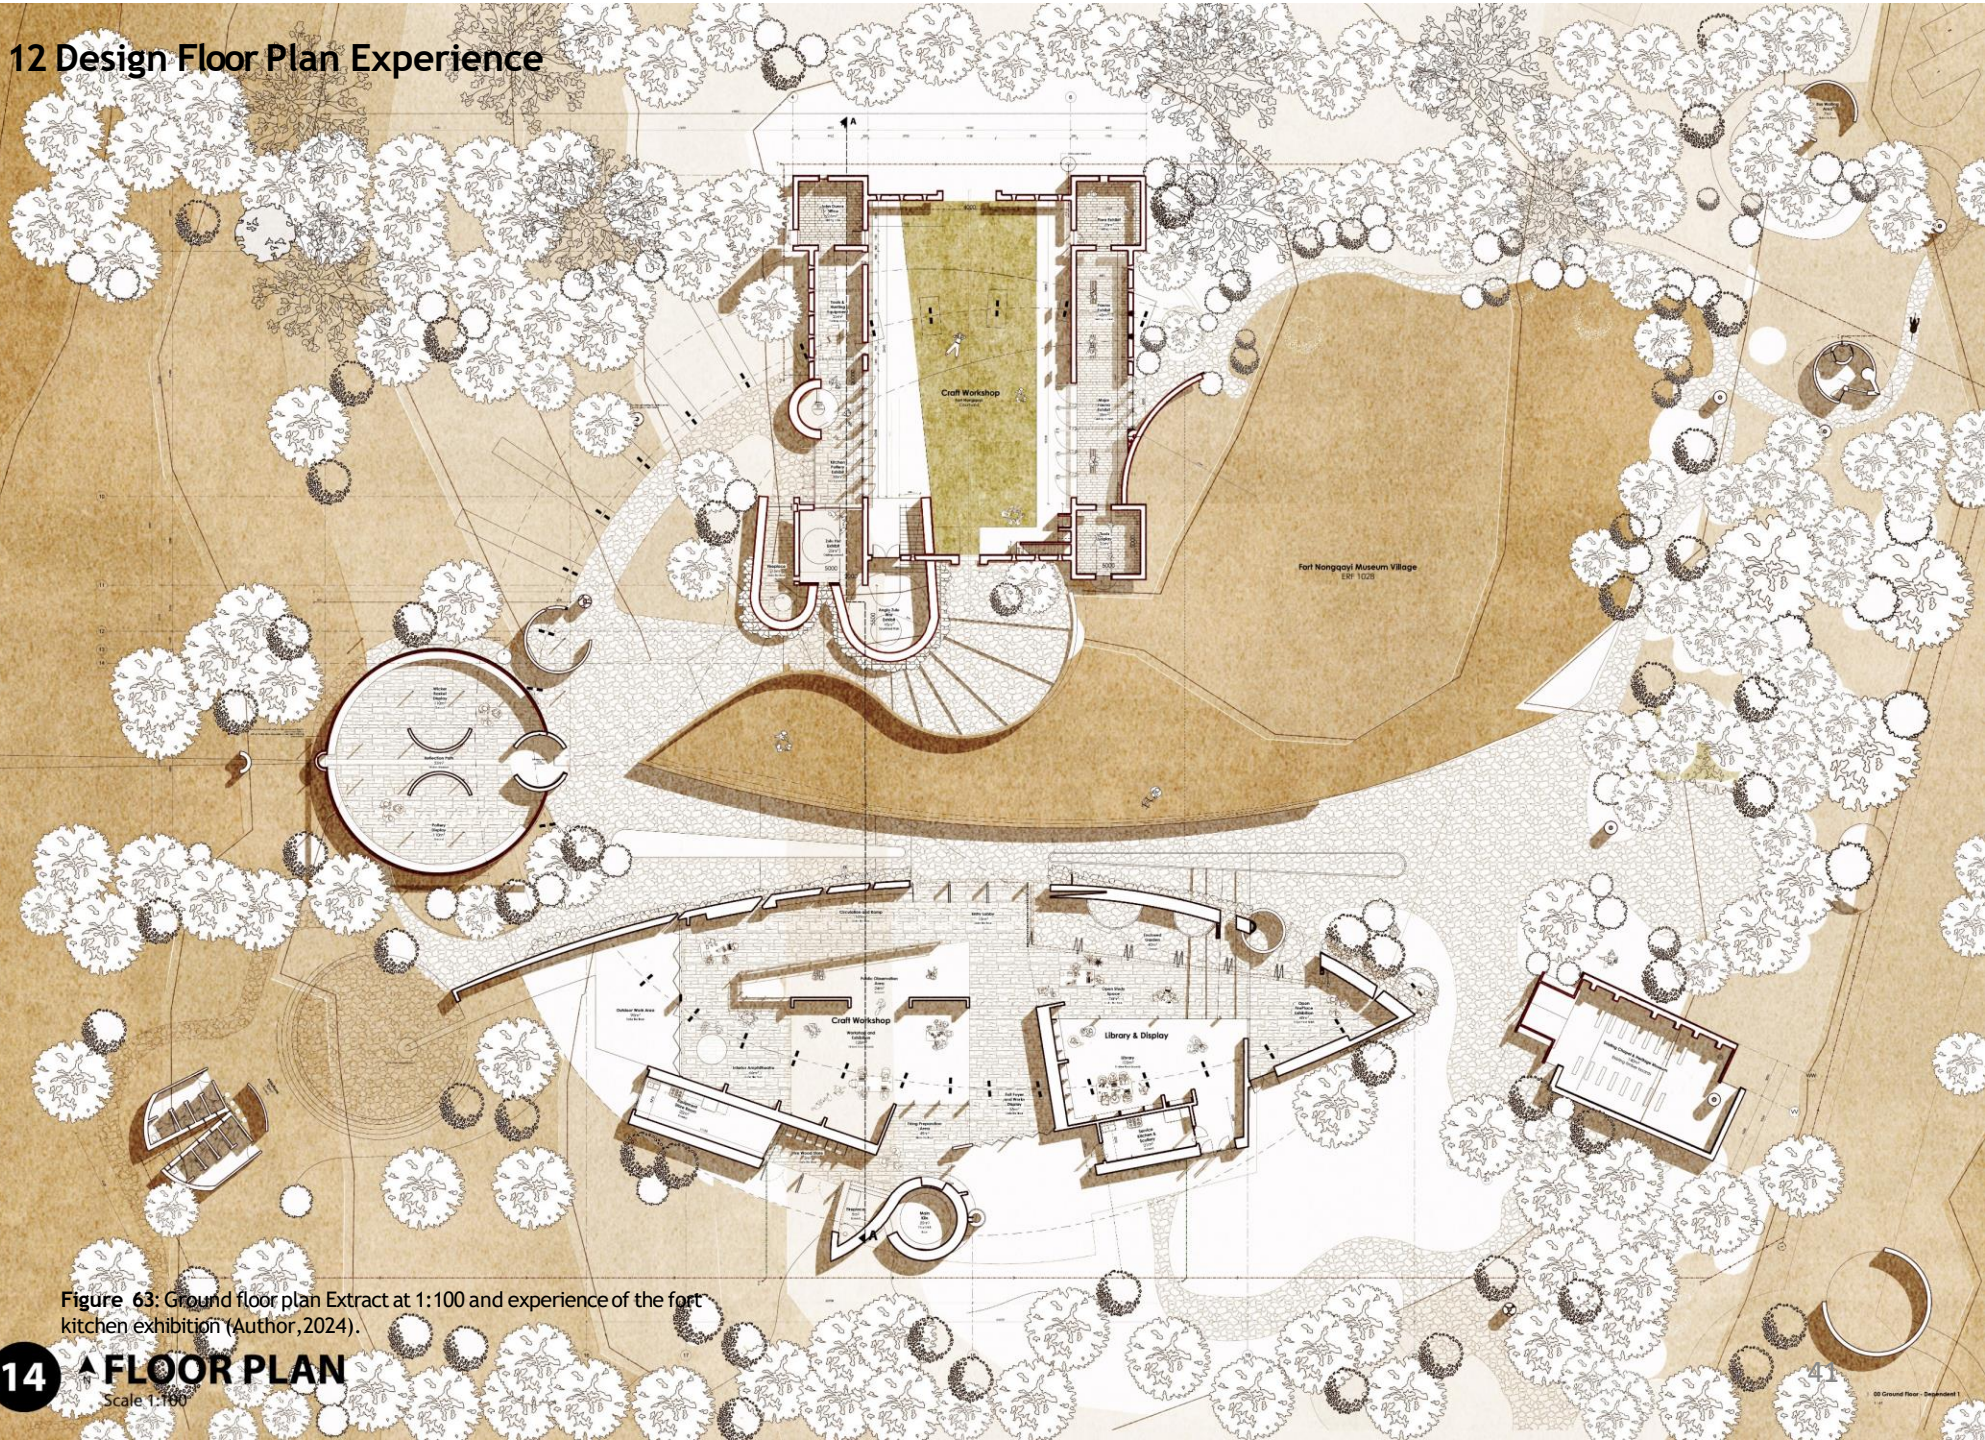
Ground floor plan Extract at 1:100 and experience of the fort kitchen exhibition (Author, 2024).
